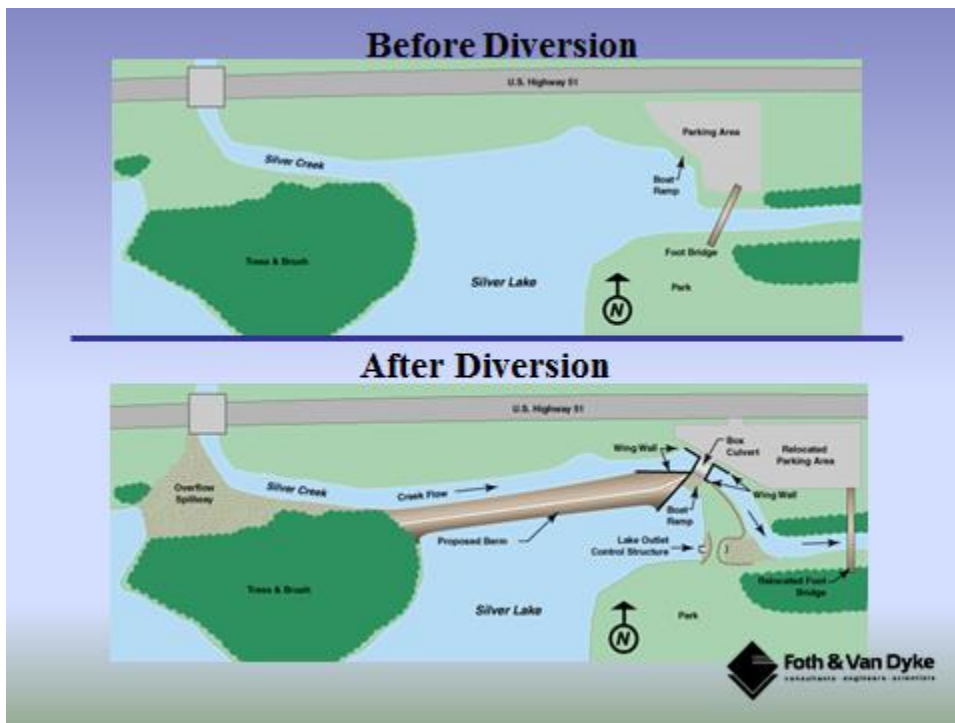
The conceptual plan for the diversion of Silver Creek out of Silver Lake by constructing a berm across the north corner of Silver Lake. The Plan was developed by Foth and Van Dyke (now Foth) Engineering, Green Bay, Wisconsin.
